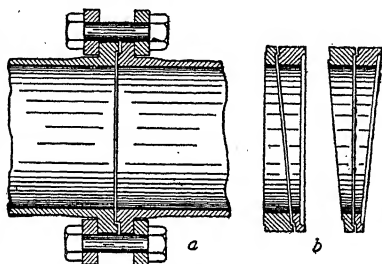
Detail of Joint Connections for Pipe Line of Water-Power Plant at Vauvry, Switzerland
